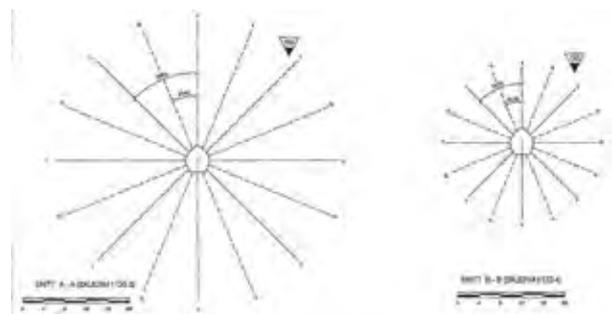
Illustration contact grouting between rock/concrete, concrete/steel
